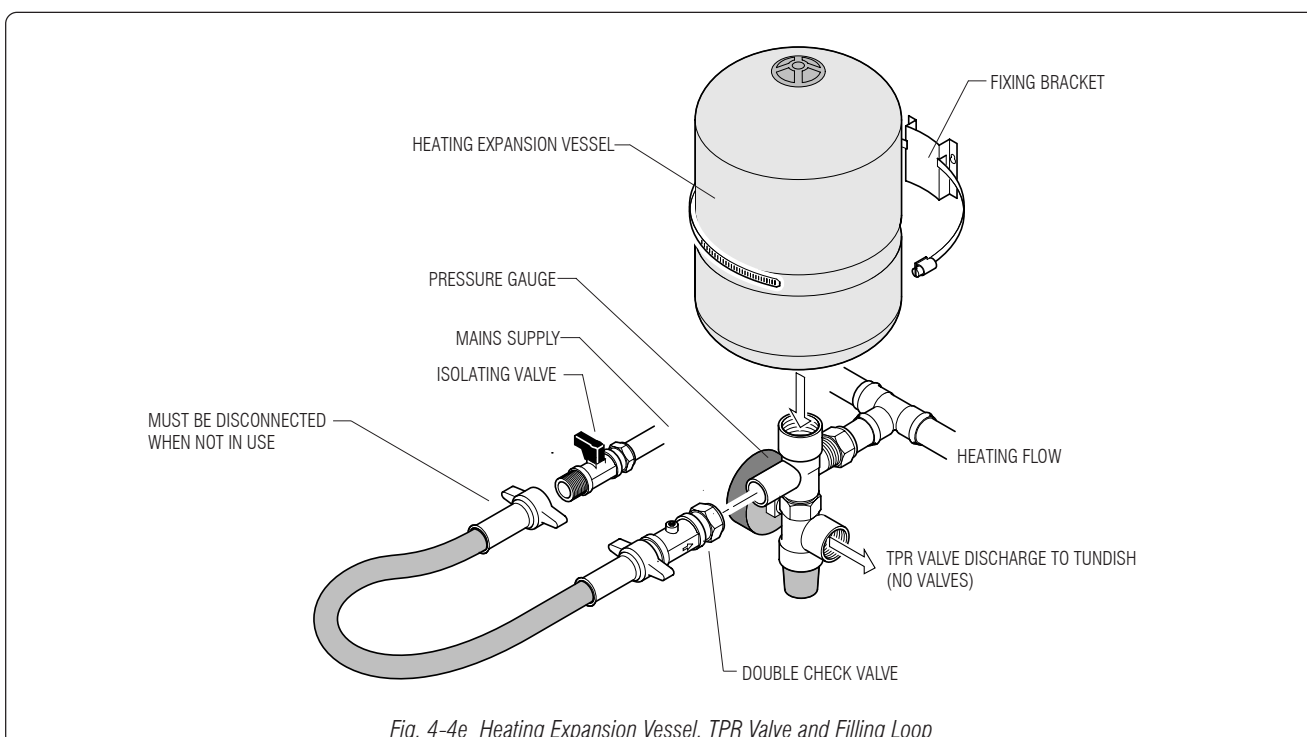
Heating Expansion Vessel, TPR Valve and Filling Loop
